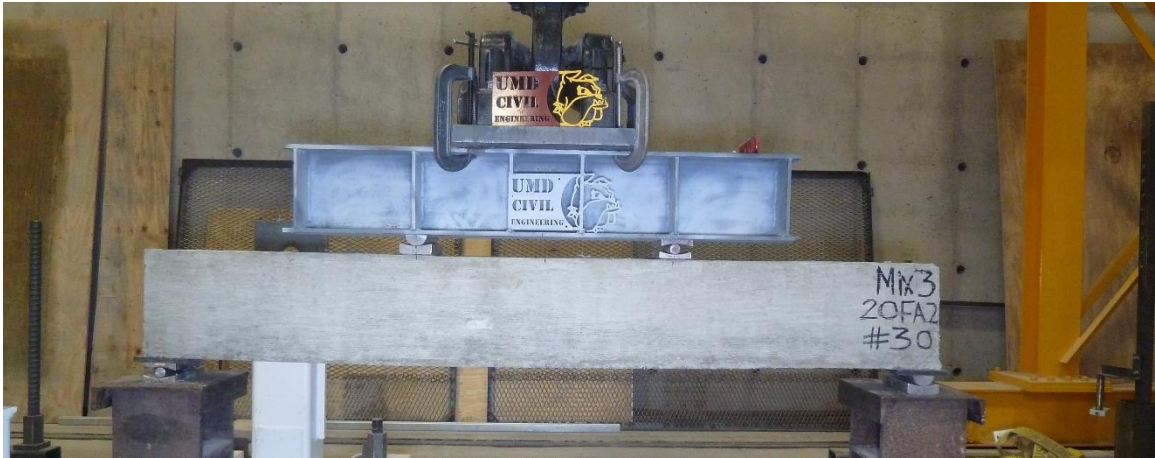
Mixture 3 (20FA2) beam #30: concrete beam before testing.
